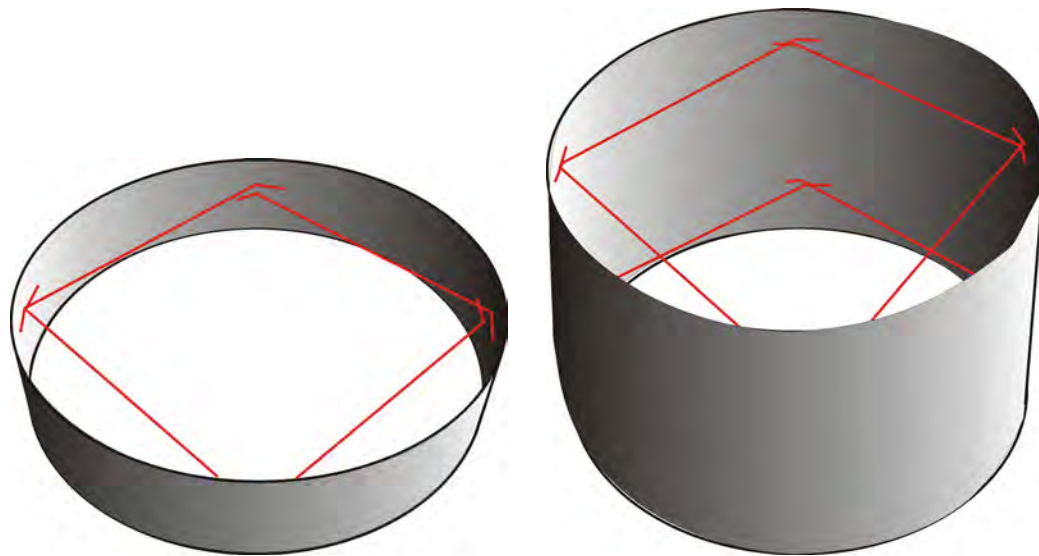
Location of steel bars in the un-reinforced concrete targets.
